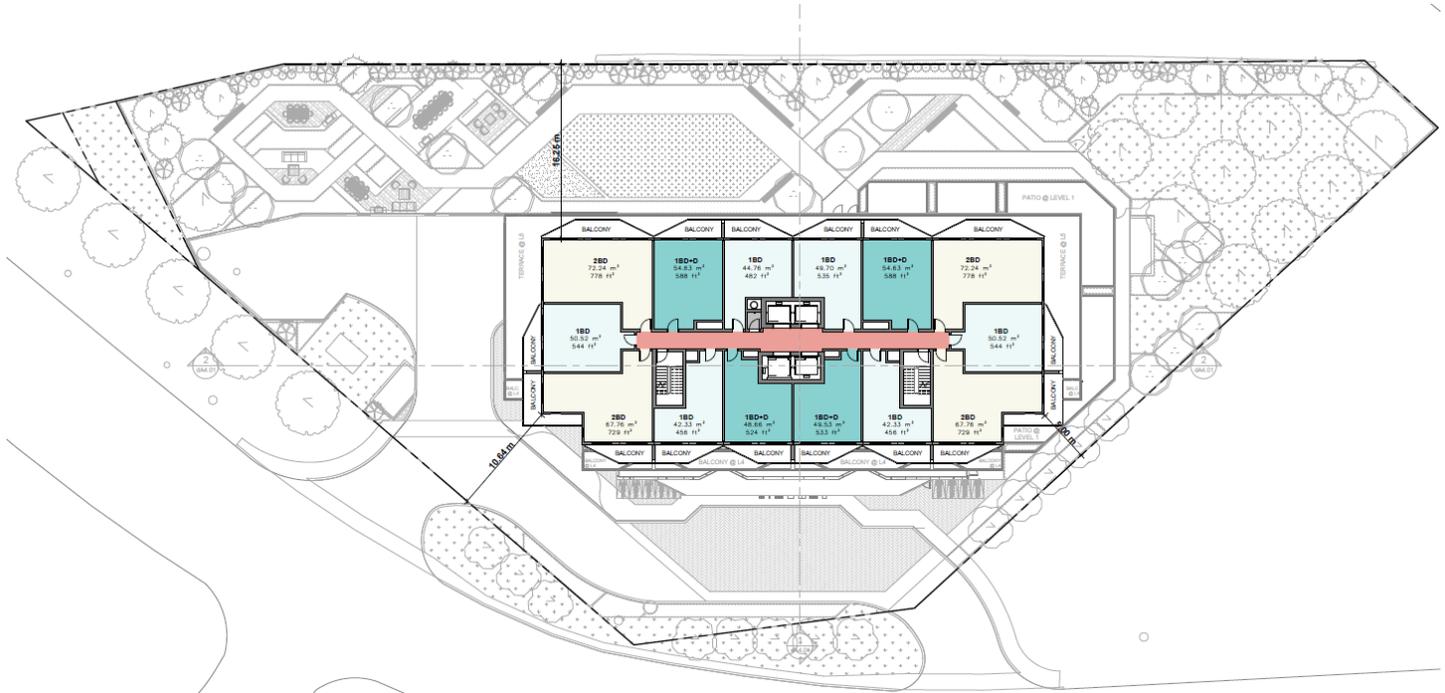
| Floor Plans Levels 6-26 (Even Levels)
